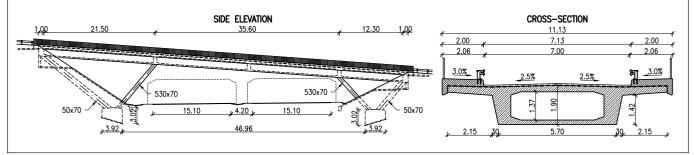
Design of bridge over M0 motorway under earth-road and footpath
